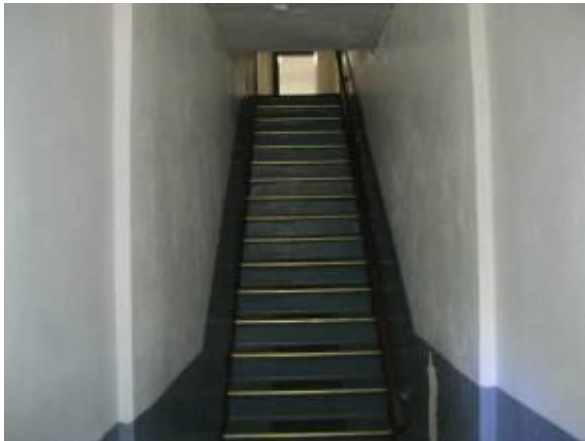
4144-46- rear stairway up to apartment units on 2nd floor.
